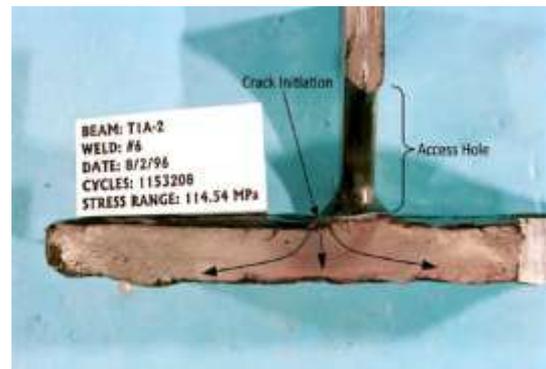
The fracture surface of an I-beam flange. Photo courtesy of US coast Guard (Kelly et al. (1997) [8]).
